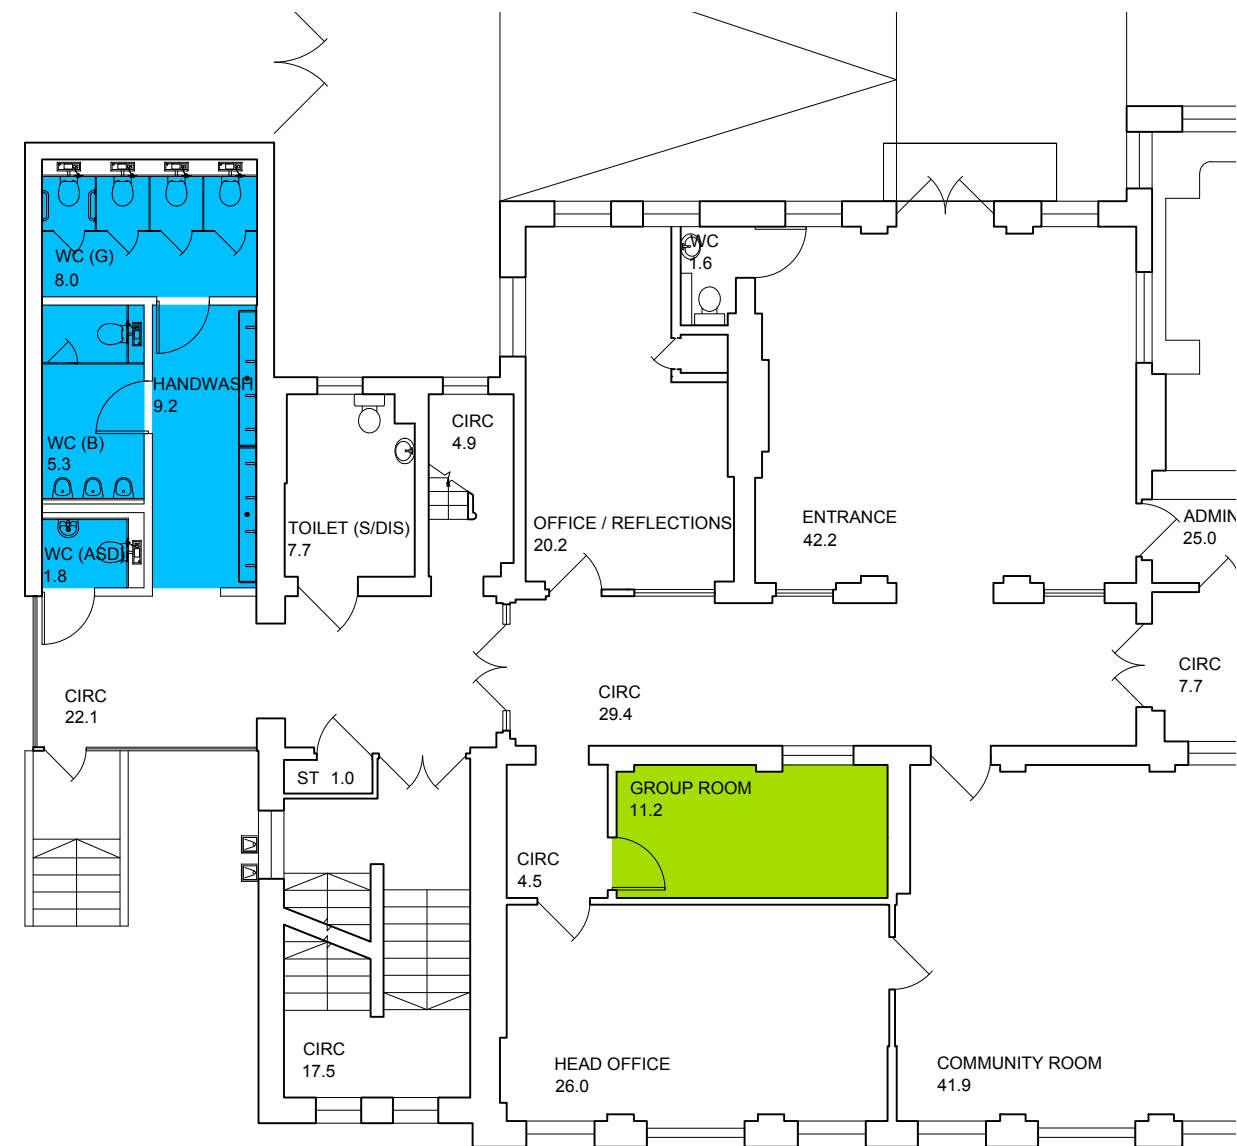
1970s WC Block and Group Room as proposed.
